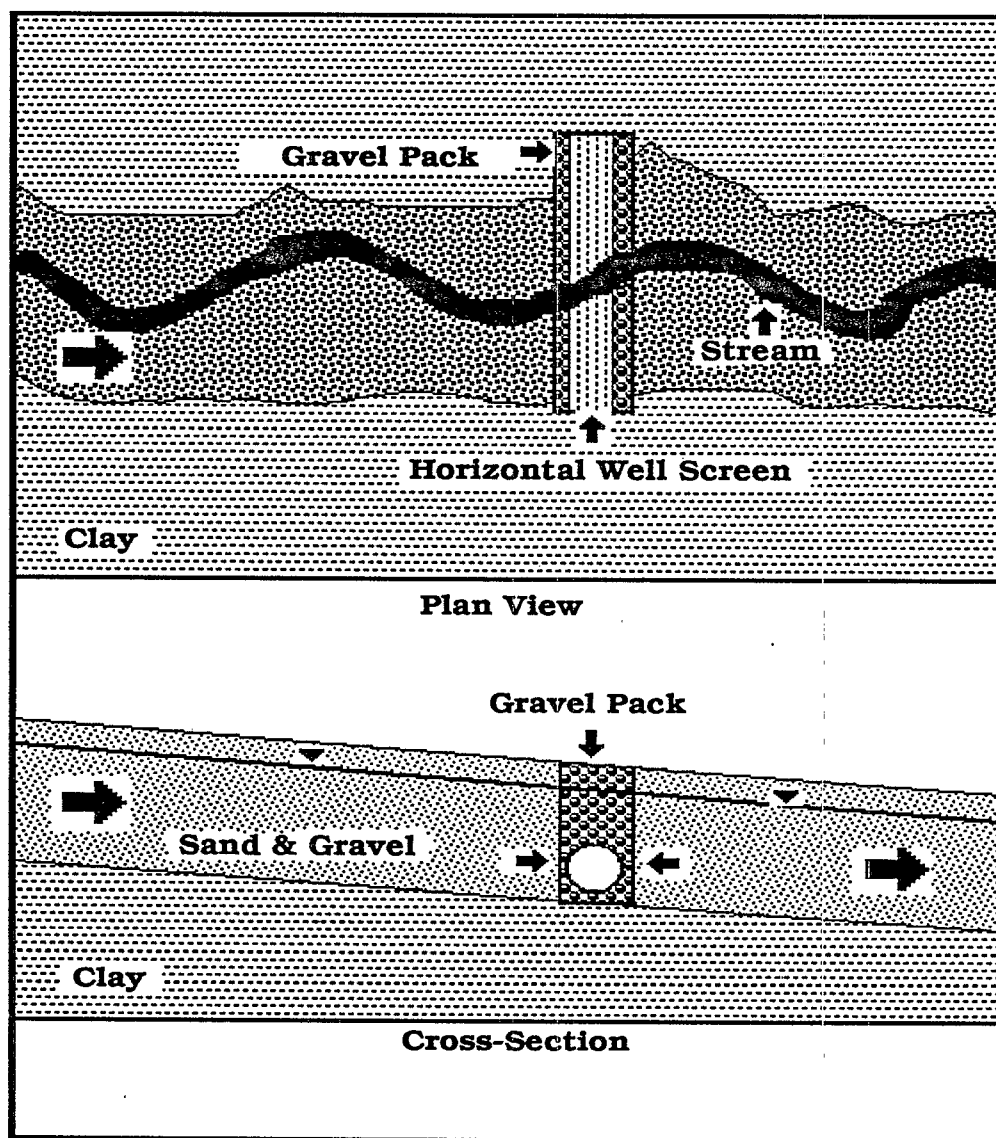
Plan view and cross-section of an infiltration gallery.
